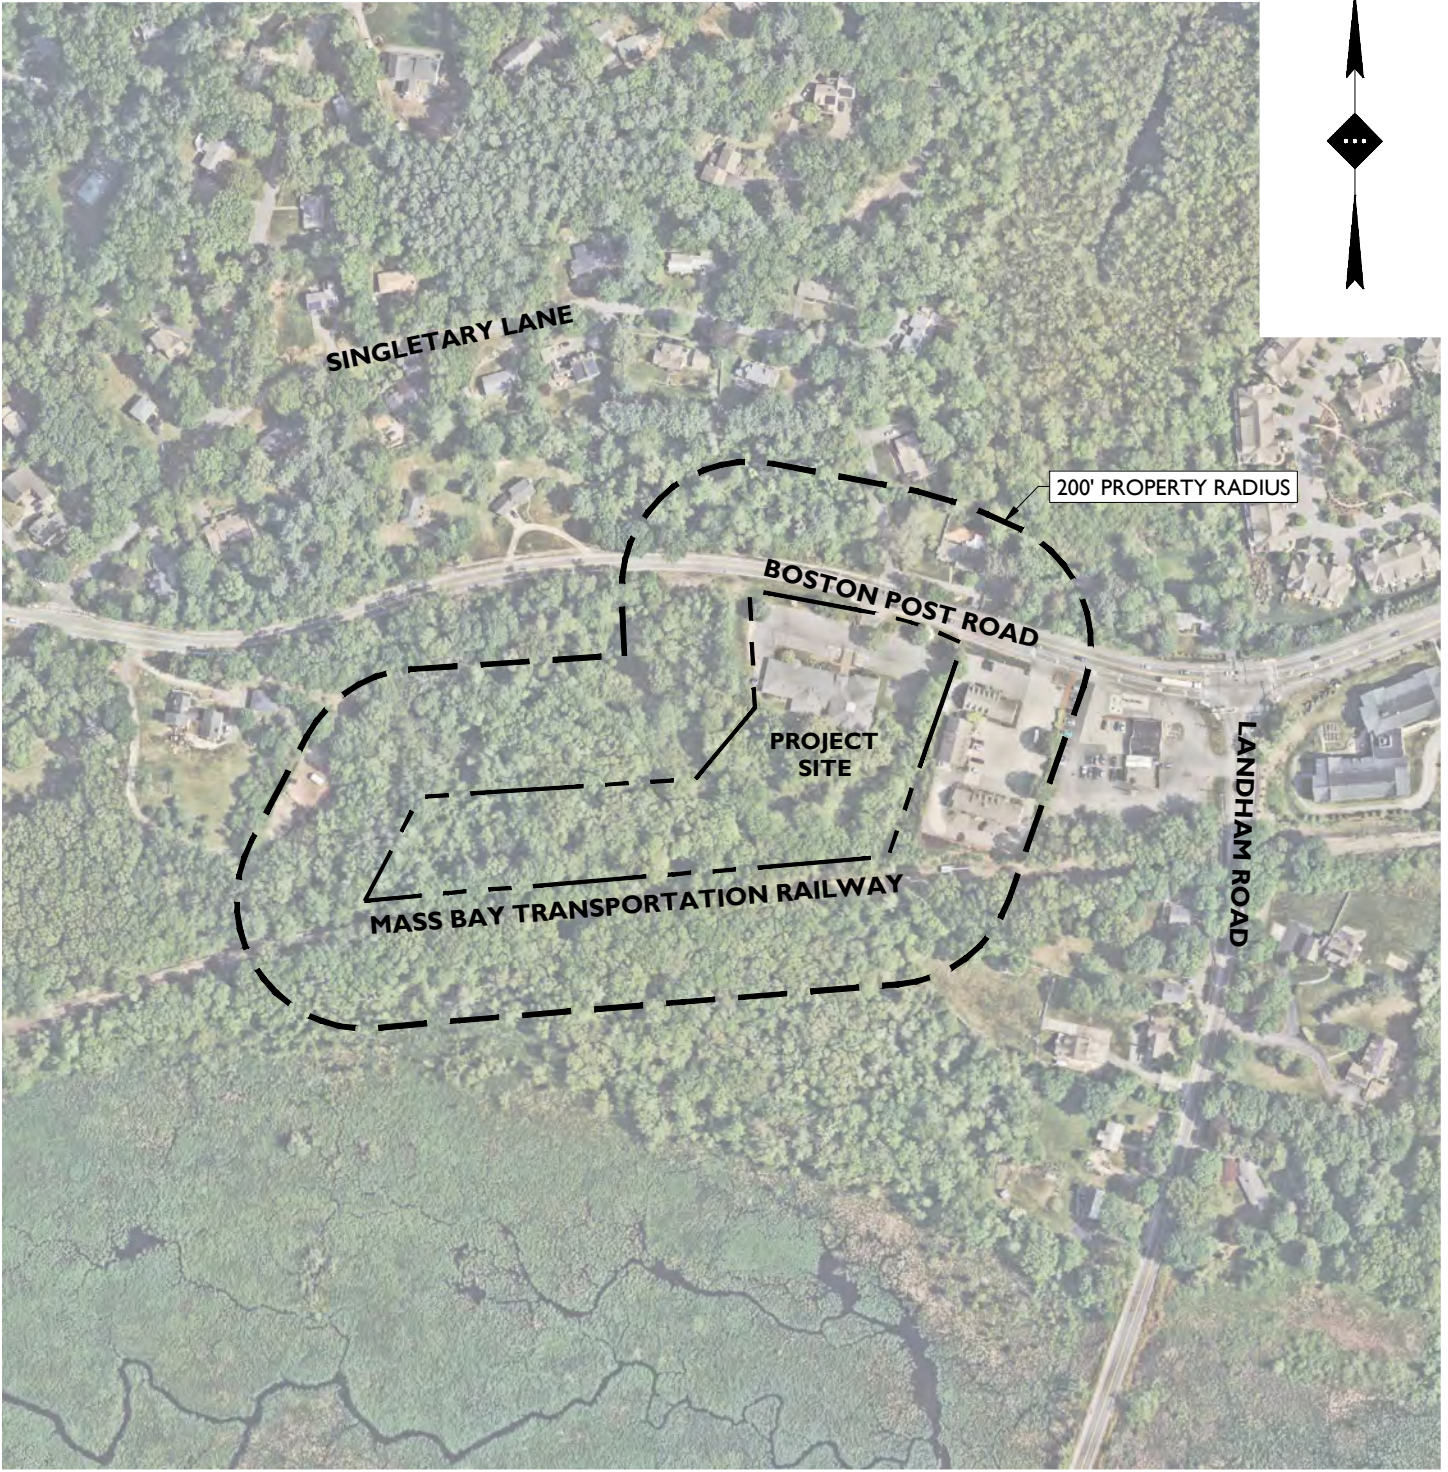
OVERALL SITE PLAN (NOT TO SCALE)
